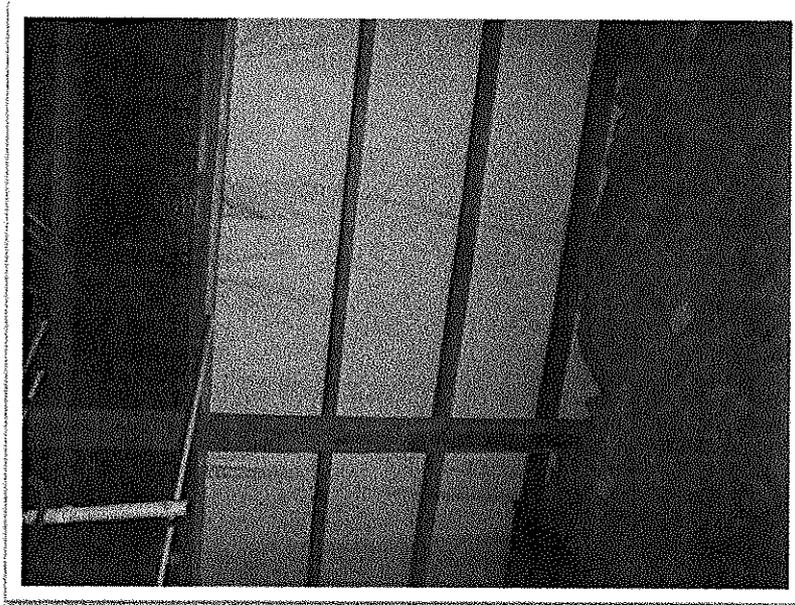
Roof, internal loft area over communal stair case, difference in under-felt
